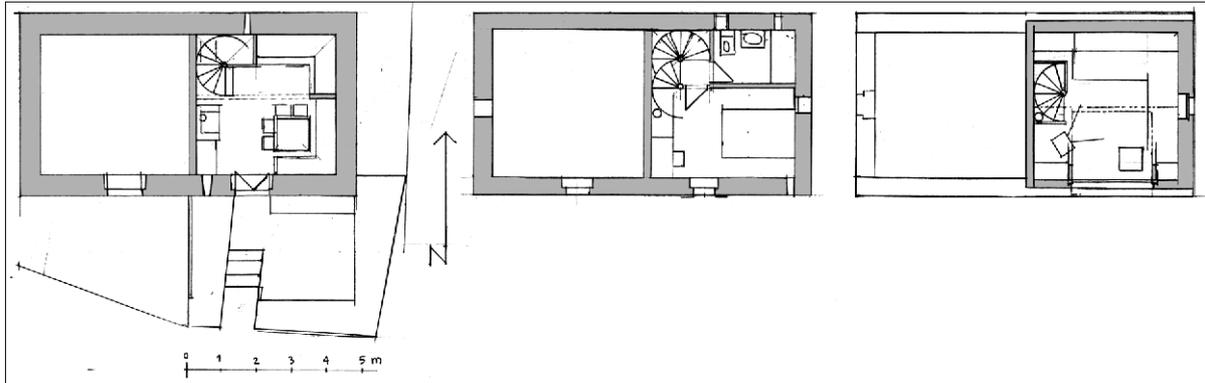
Renewal – ground floor with terrace, 1st floor and loft space
